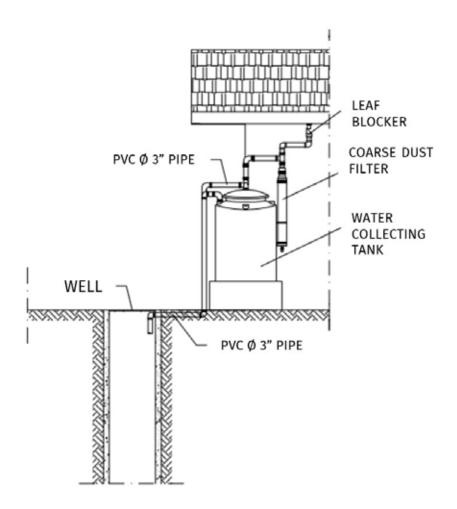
Detailed Section Drawing of Mr. Purwanto's House
